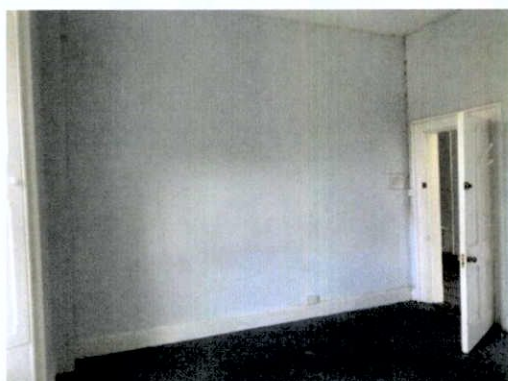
Typical upper floor accommodation. Original four paneled door and architrave.
